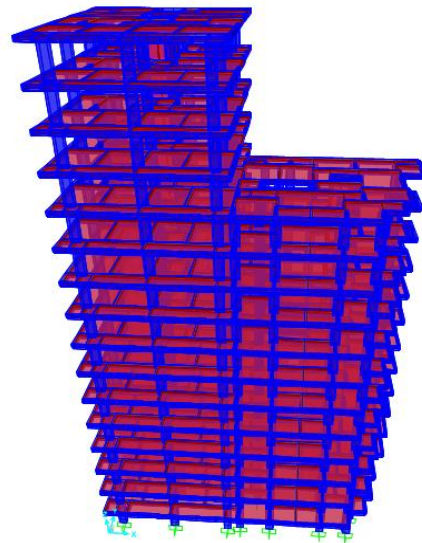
3D View of G+15 building with 3.2m floor to floor height & G+11 buildings with 3.2m floor to floor height without FVD
